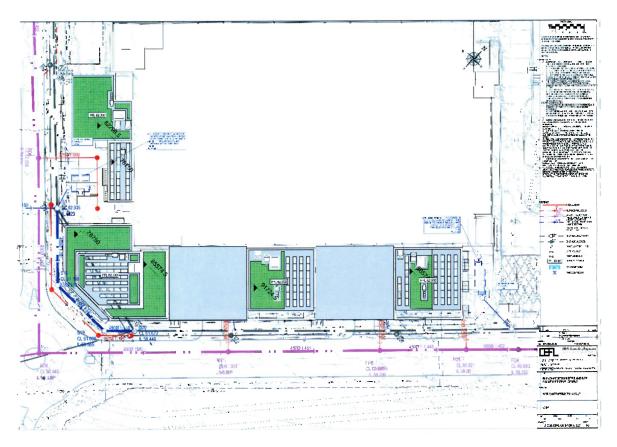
Site C Site Services Layout (210048-DBFL-CS-SP-DR-C-1321 Site C Site Services Layout)
